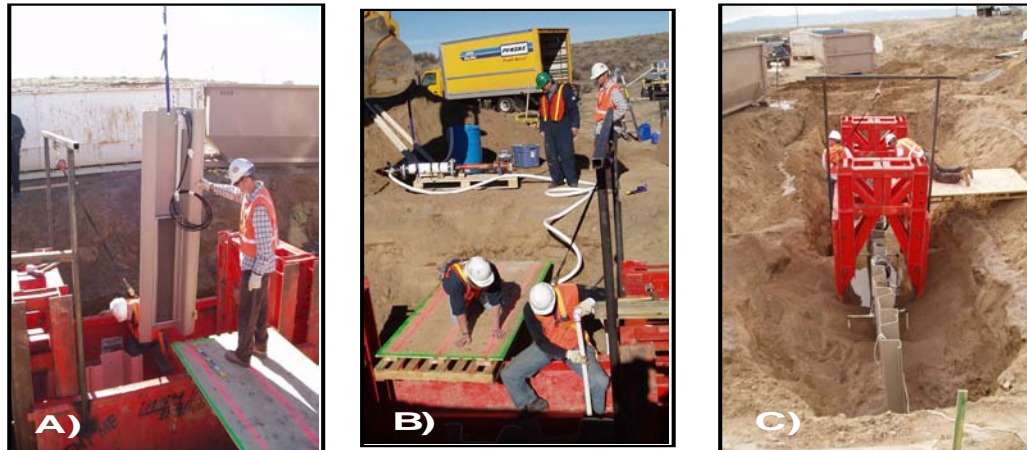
A) Setting the panels inside the trench box to the top of the Pierre Shale, B) emplacing a cement-bentonite seal at the base of the barrier, and C) a photo of the sheet pile prior to backfill with native sands.
